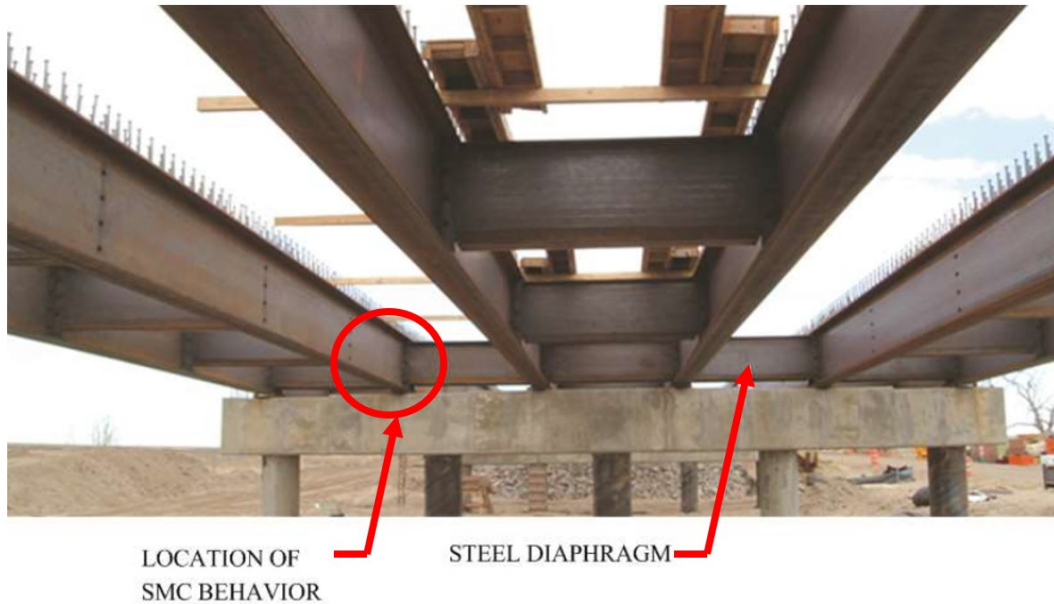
Steel Details for SH 36 over Box Elder Creek [6].
